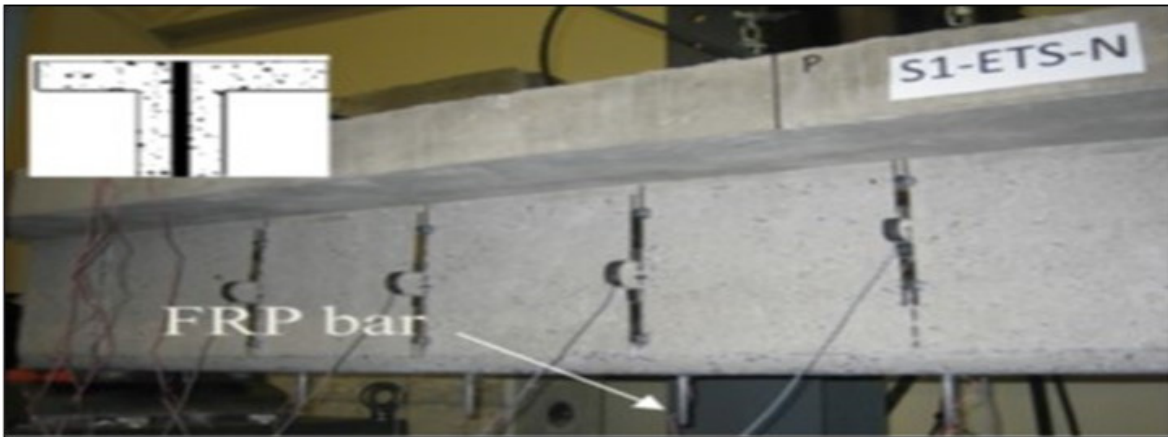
Shear strengthening of reinforced concrete beams via ETS approach
